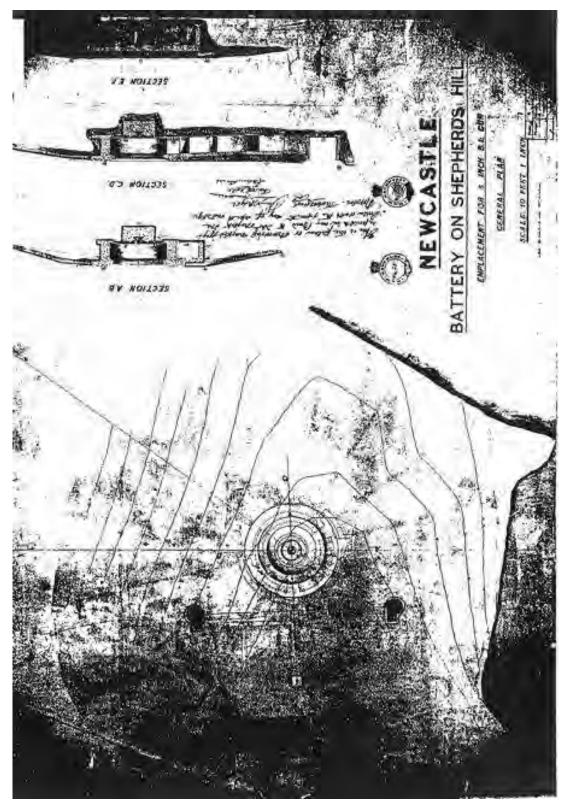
The Contract Plan for construction of the Battery. (Source: Gardner Browne, Planning Consultant, Shepherds Hill Cottage and Surrounds – Conservation Study, For Newcastle City Council, 1984, Figure 1)
